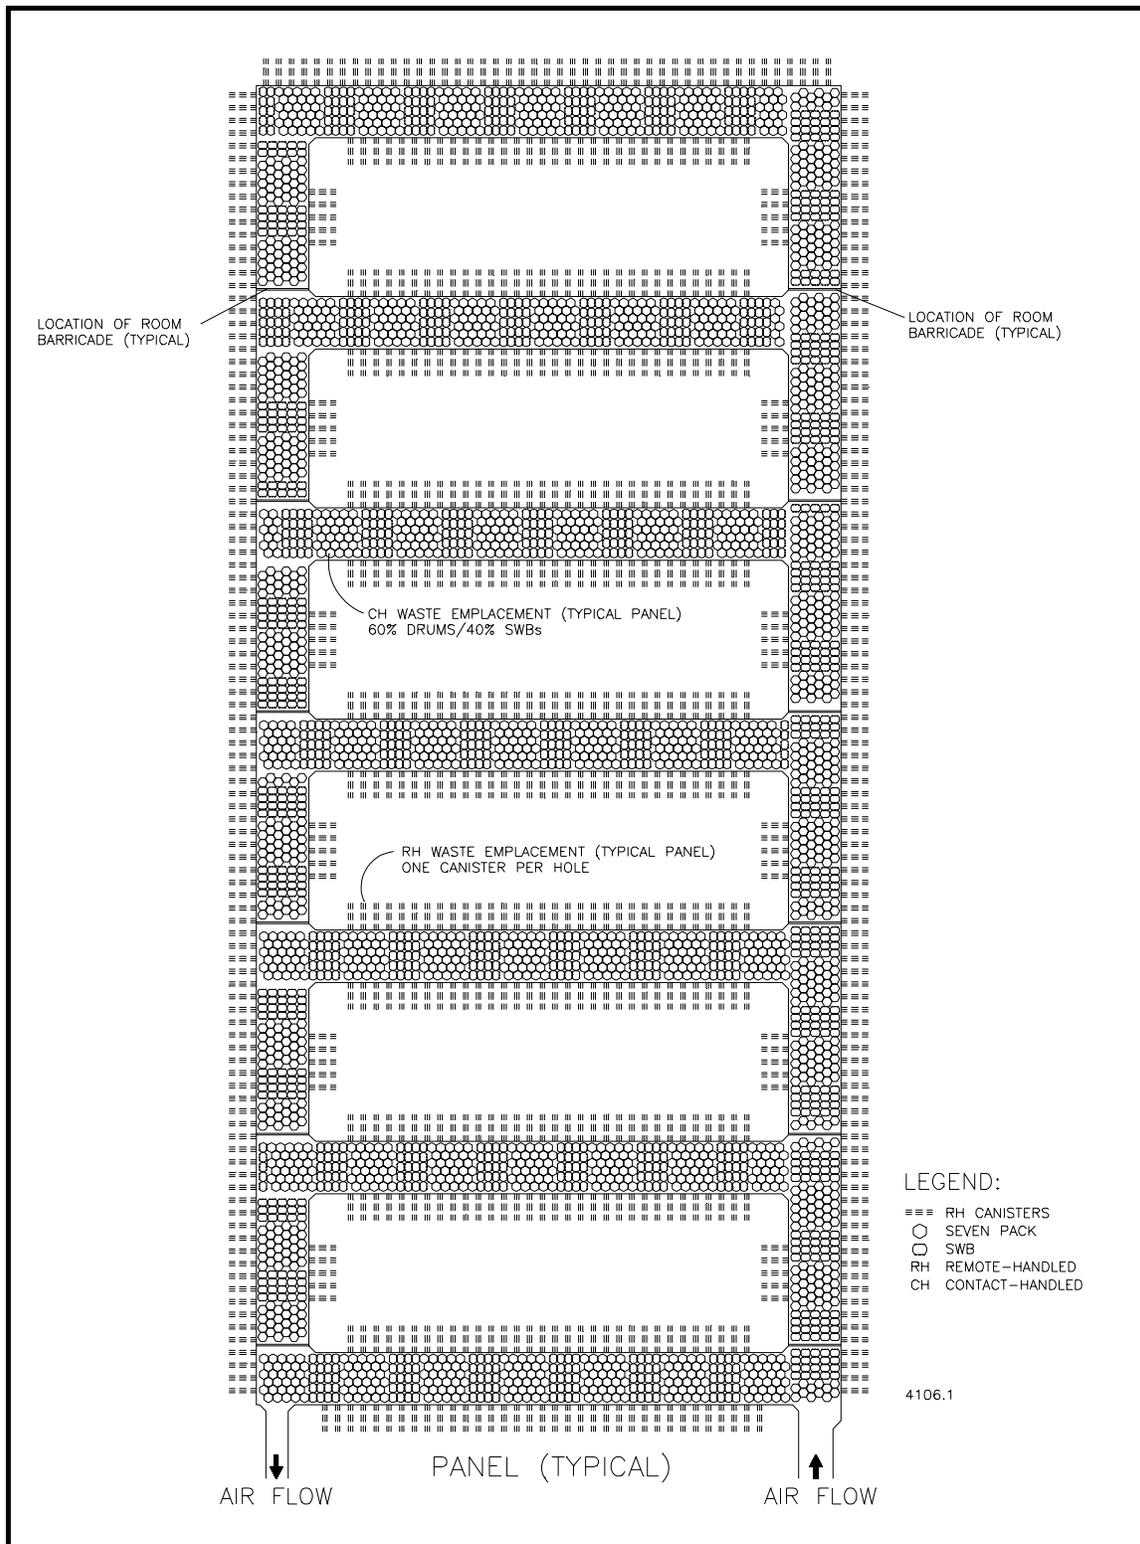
, Typical RH and CH Transuranic Mixed Waste Disposal Configuration
